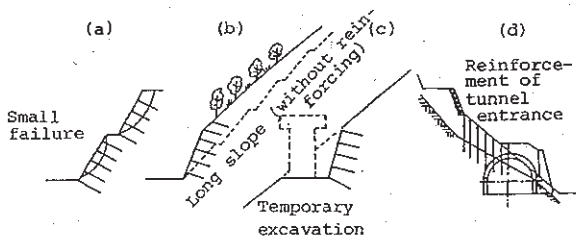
Simplified drawing of applications of reinforcing earthwork with steel bars
